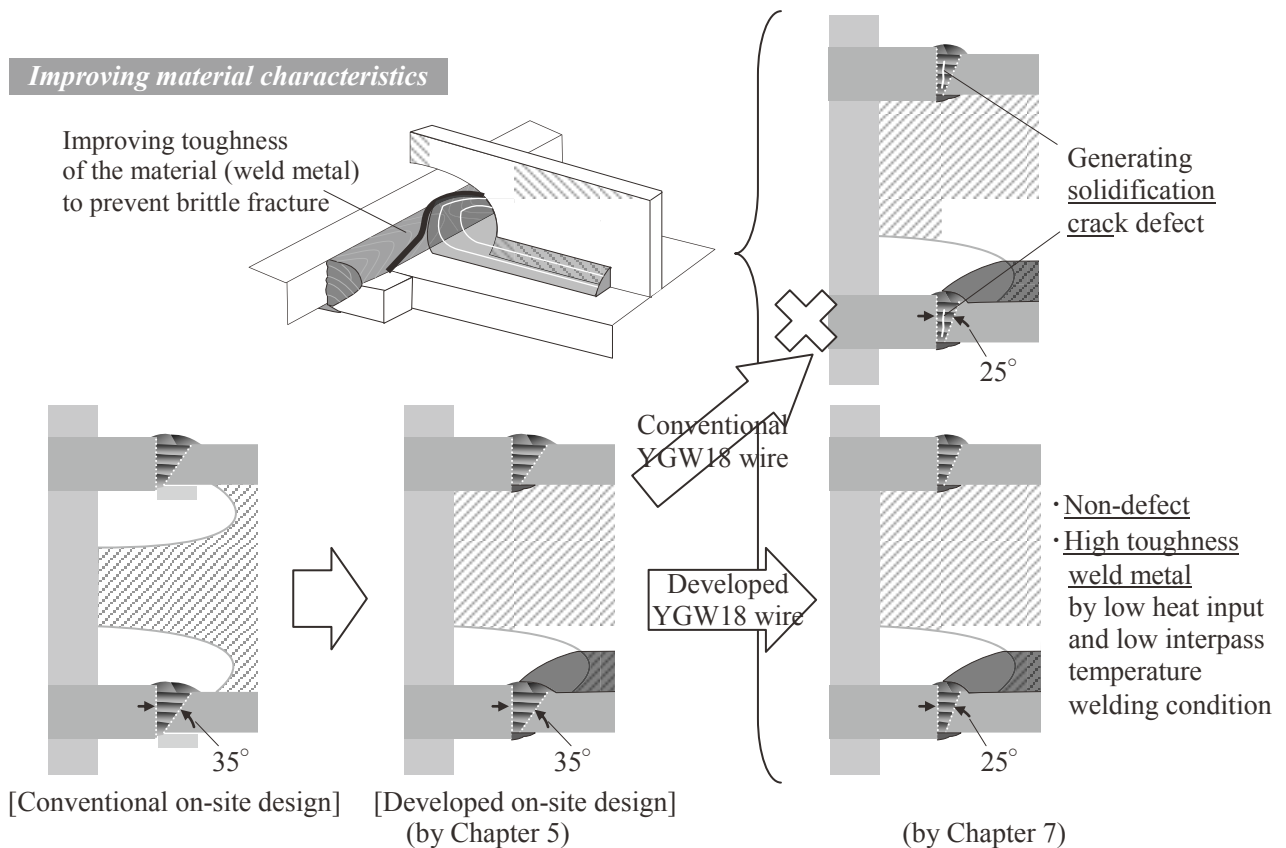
Solidification crack problem when the groove angle make narrow to improve the weld metal toughness, and preventing method by new composition welding wire improving the solidification crack resistance
